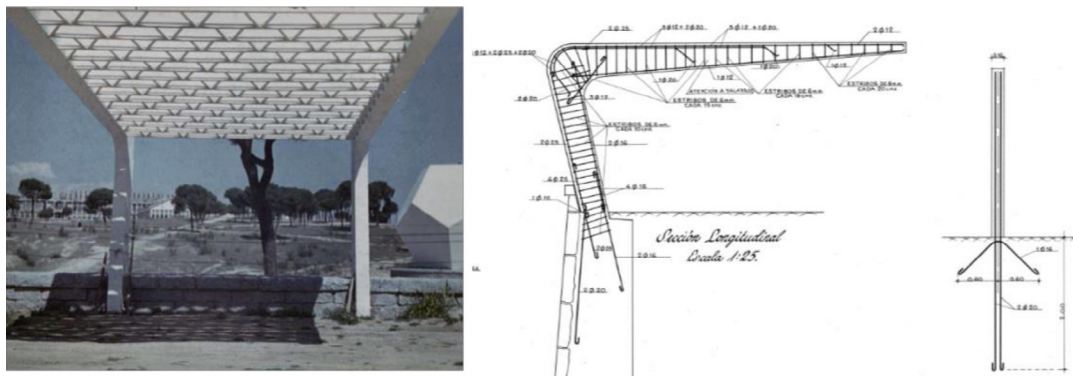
Car park pergola: construction and reinforcement drawings (38).
